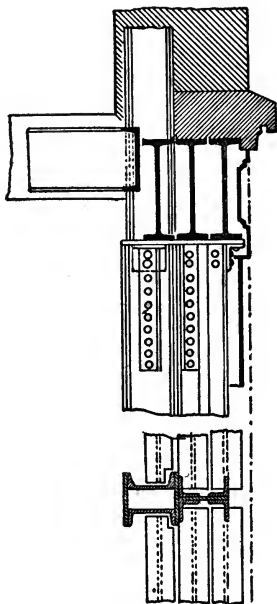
Detail showing Masonry Walls carried at Second Floor Level.
